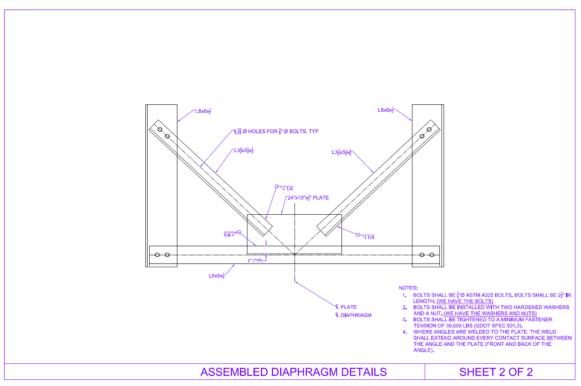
Engineering Drawing. Fabricated k-frame replica (3 of 3)
